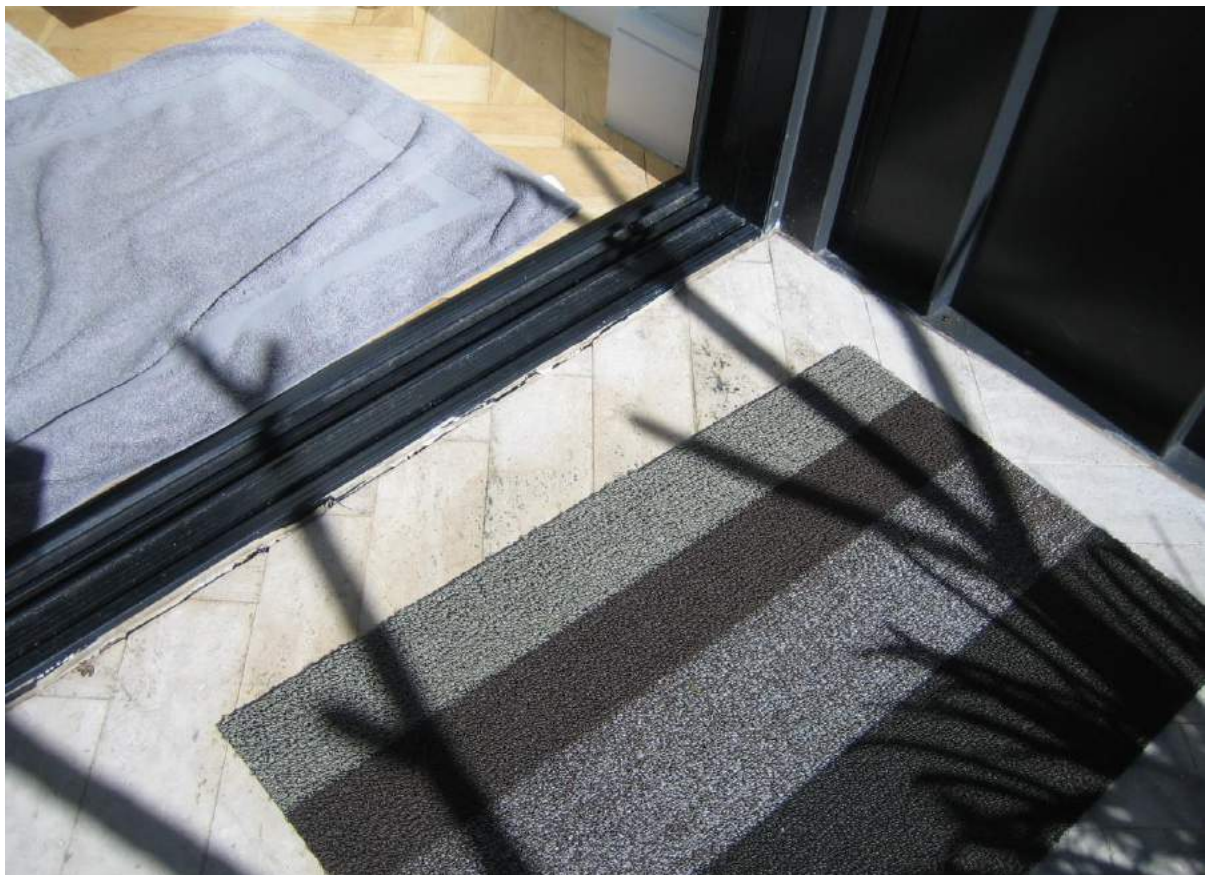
Water penetration and damage in the living room balcony door in Unit 408.
